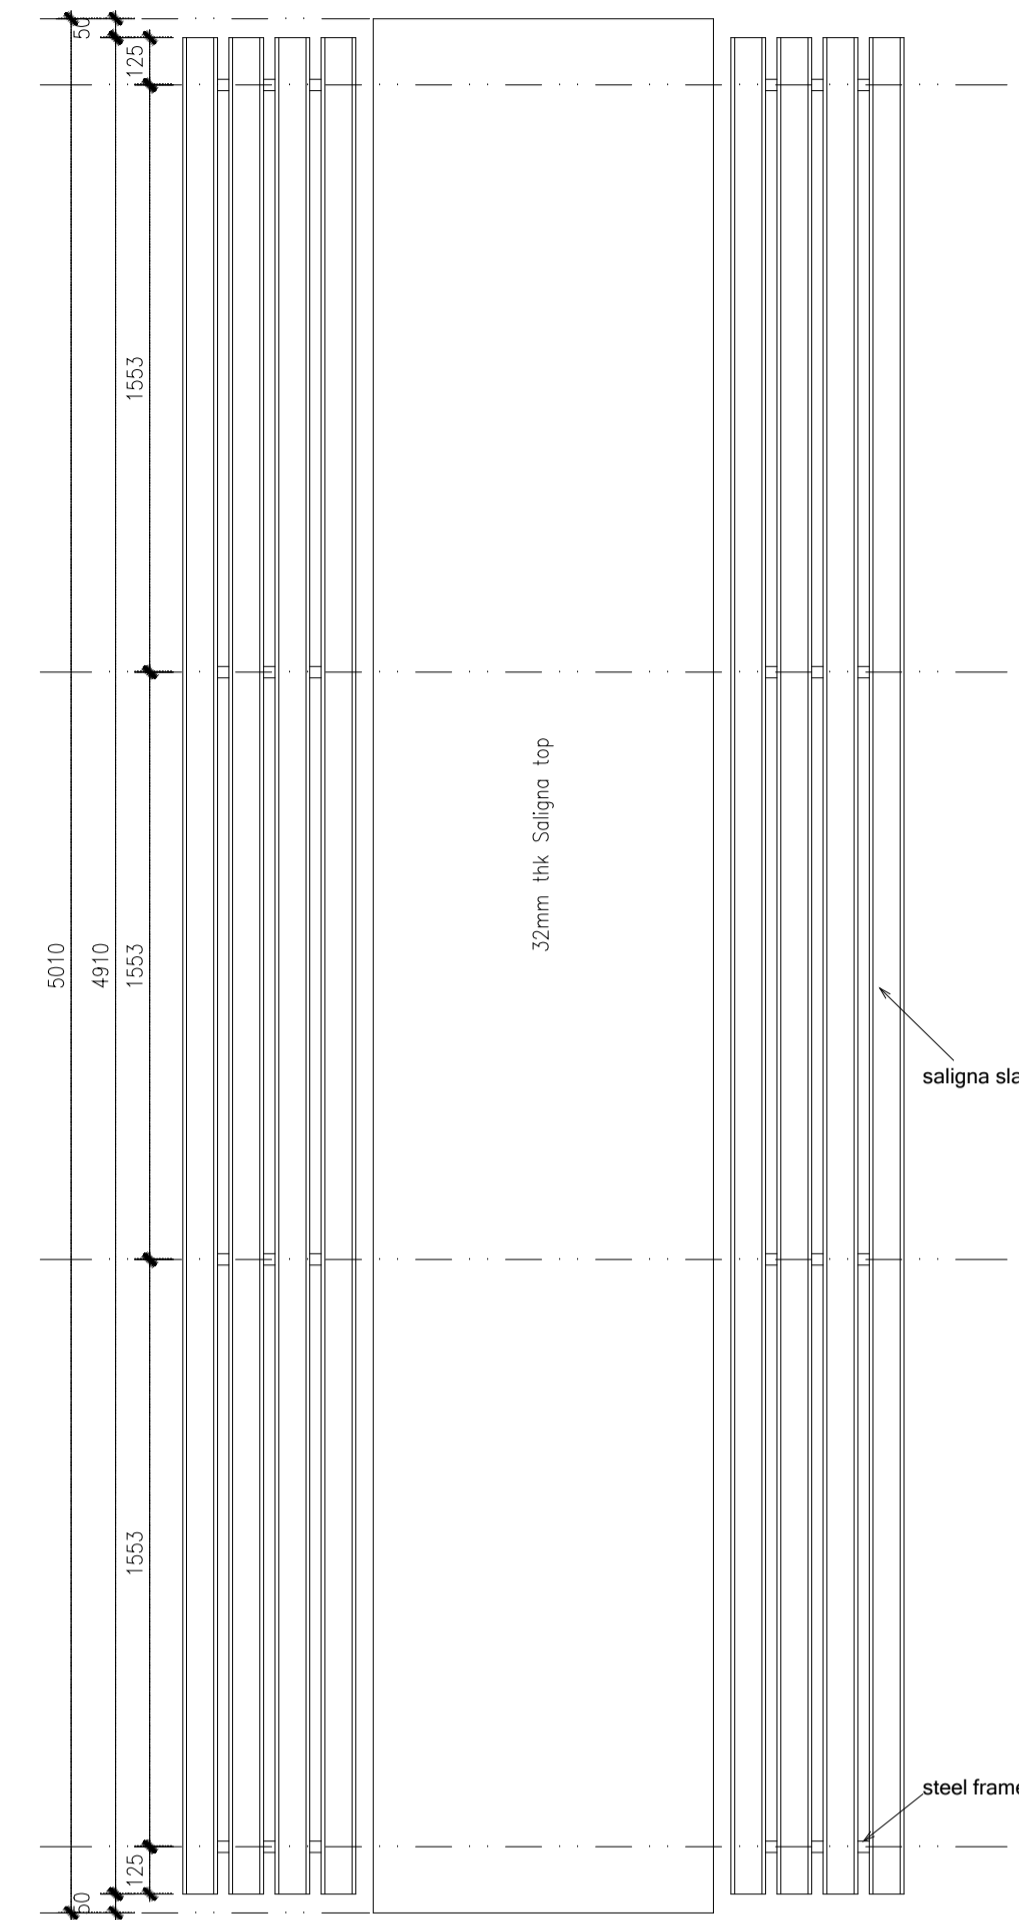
(STORE ROOM SHELVES) Section Scale 1:20
